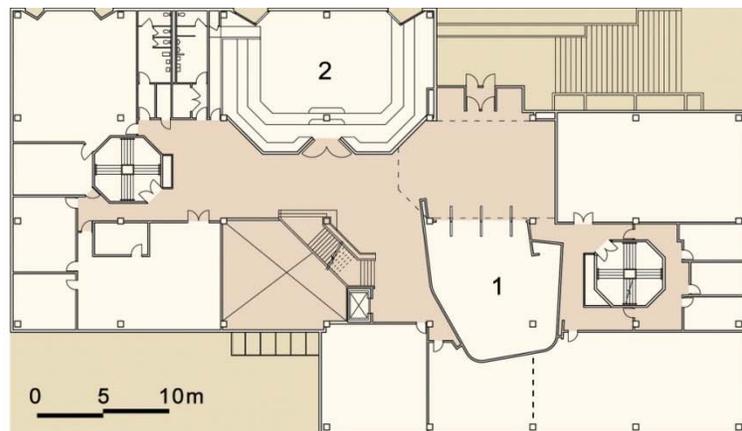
(right) Second floor plan of the Architecture Building. (1) Gallery. (2) Room ARC 202 - Lecture room (Pit).
